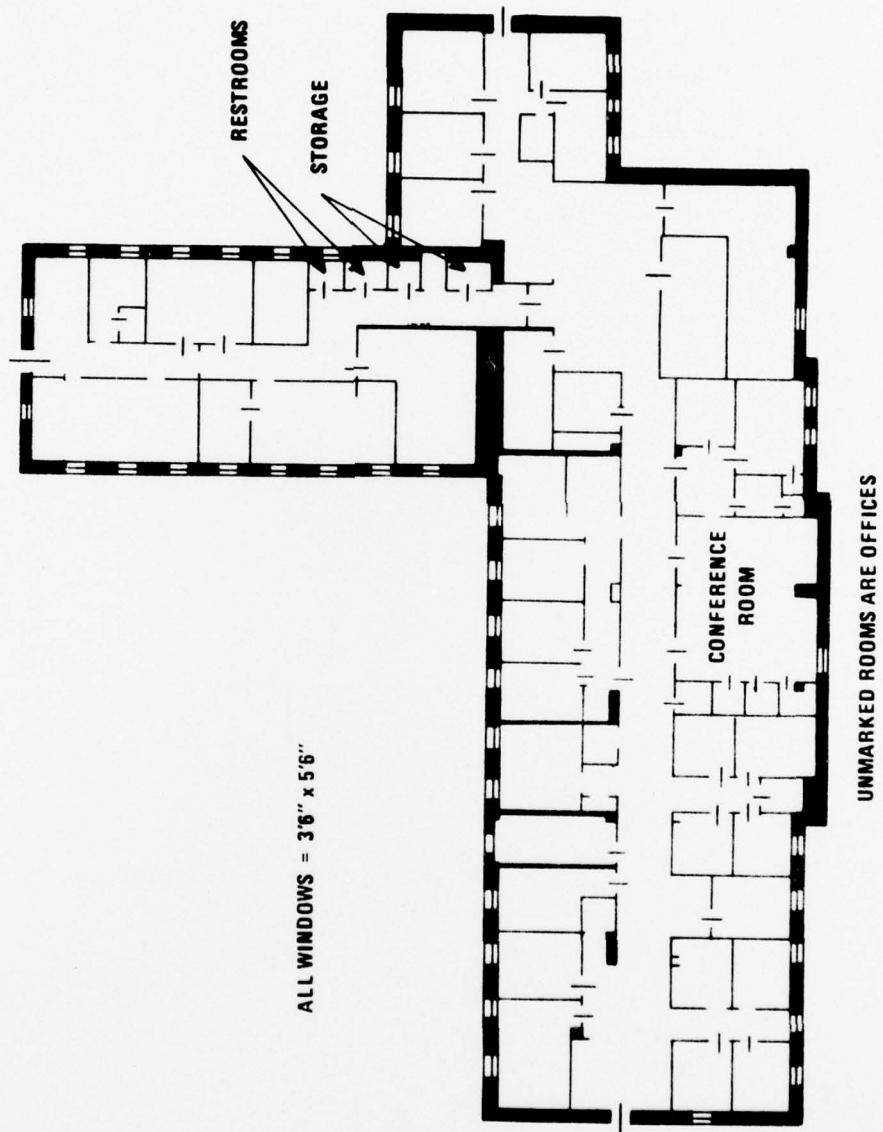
FLOOR PLAN OF BASSETT BUILDING
